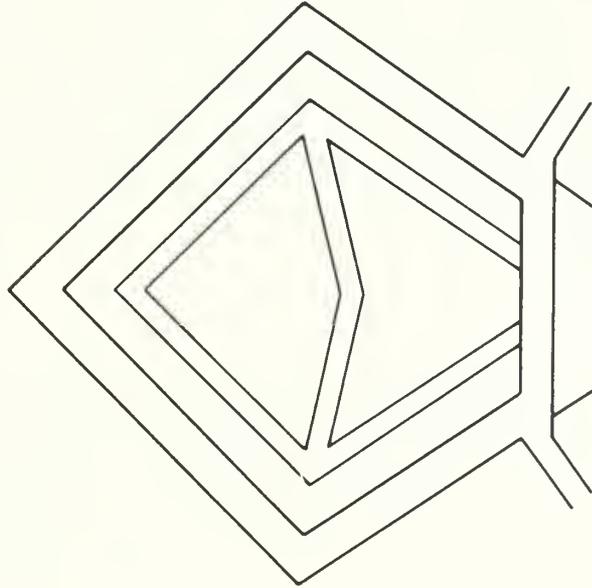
Early Stages of Bastion Construction. In stage 1, bastion foundations and adjacent curtain walls were laid as a single unit. During stage 2, a platform or inverted gorge is believed to have been added, as was a parados or interior foundation, to support the terreplein or gun platform. Both additions would have been completed before October 1840. By stage 3, a corner was added and the bastion became the commissary foundation. The inverted gorge and possibly the parados foundation was removed in 1845 when these changes occurred.
